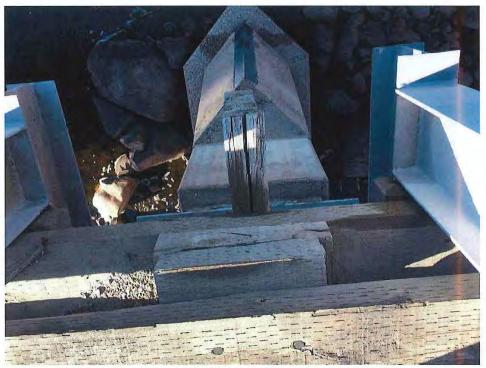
LOOKING DOWN AT TYPICAL STRINGER AT PIER
